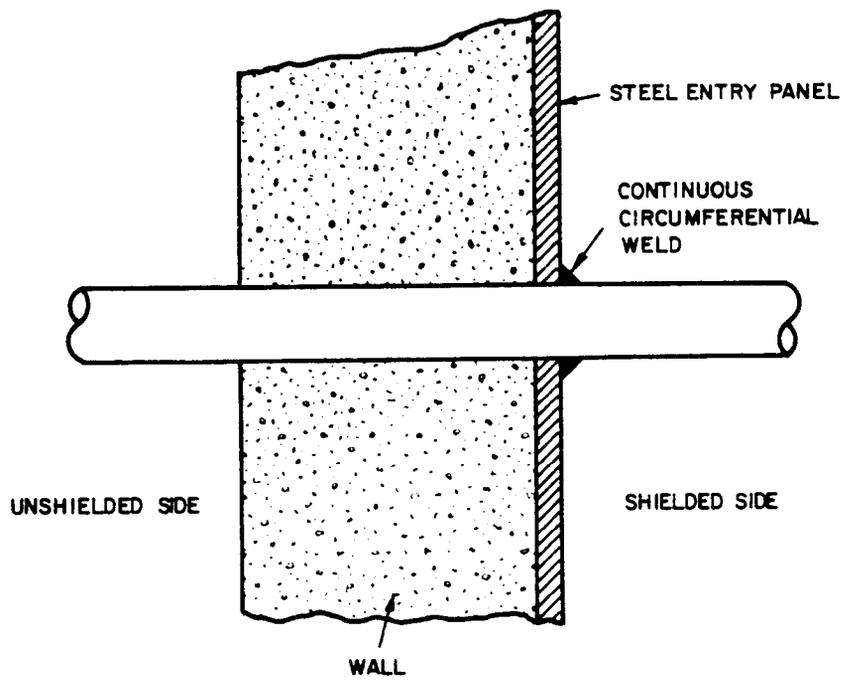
Conduit or metal pipe penetration design. (Source: ref 5-7)
